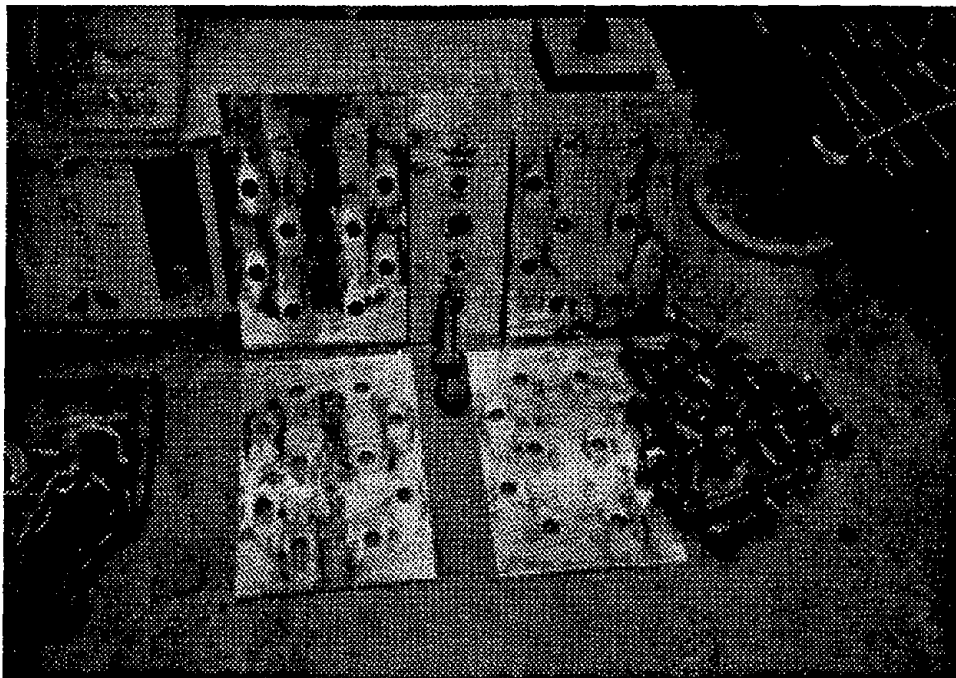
Photograph showing the brass shims and bolts taken out from Specimen 7A after the test.
